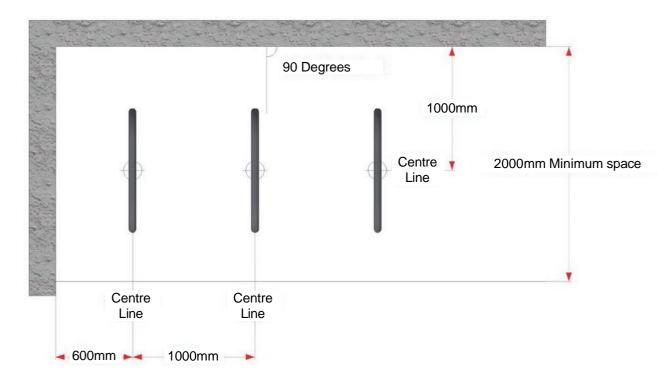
Standard layout for Sheffield style stands located next to a building or within a structure.
